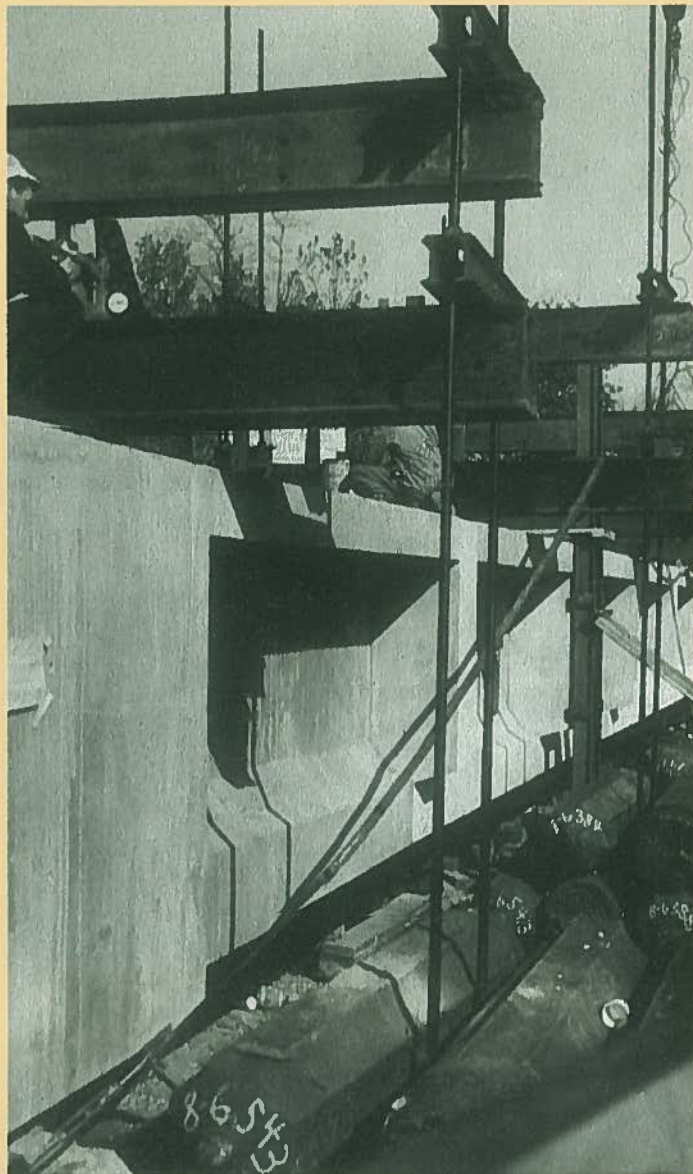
Testing a 150 ft (46 m) test girder for the Walnut Lane Bridge, circa 1949.
